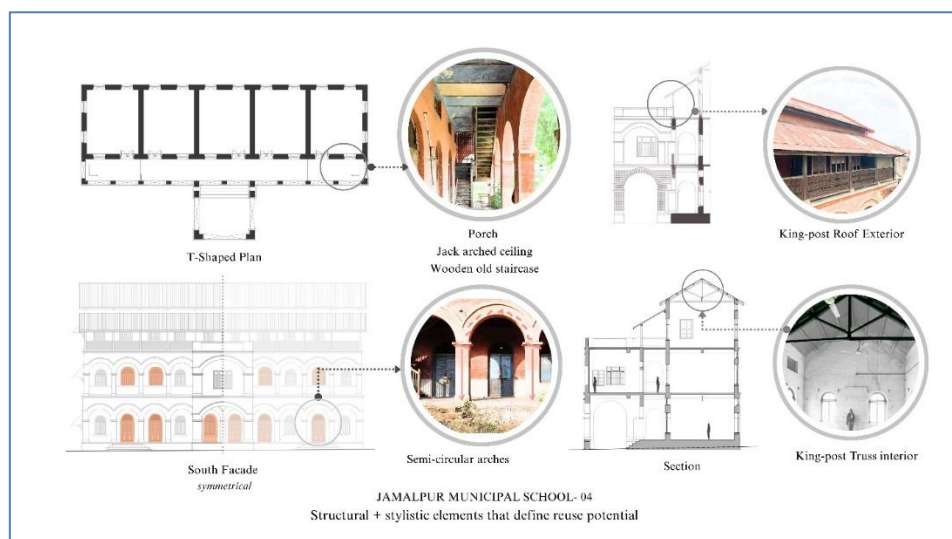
Architectural elements of Shaala No. 4: sandstone plinth, brick arches, jack-arched ceilings, and king-post truss.
